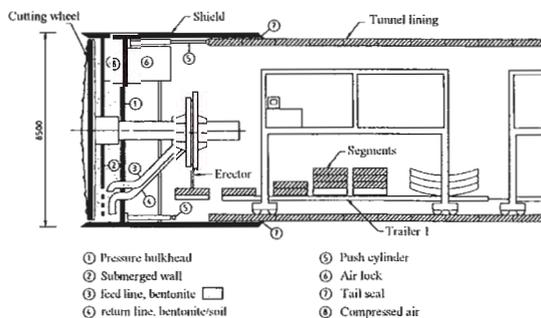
schematic section of a slurry shield Tunnel Boring Machine.
